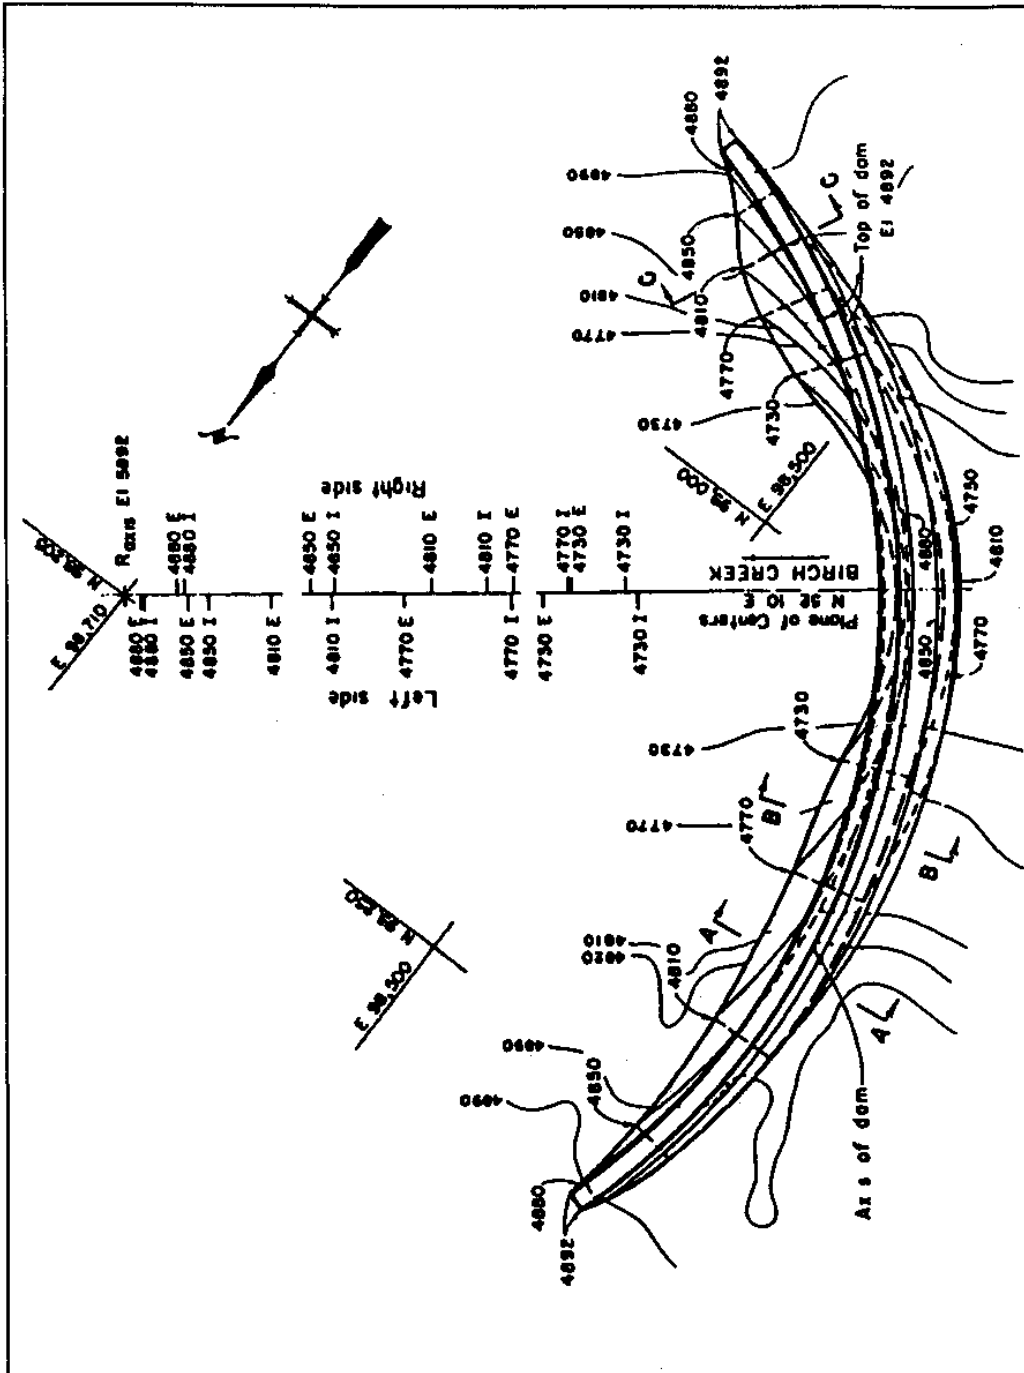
Typical two-centered variable-thickness arch dam in a nonsymmetrical site
